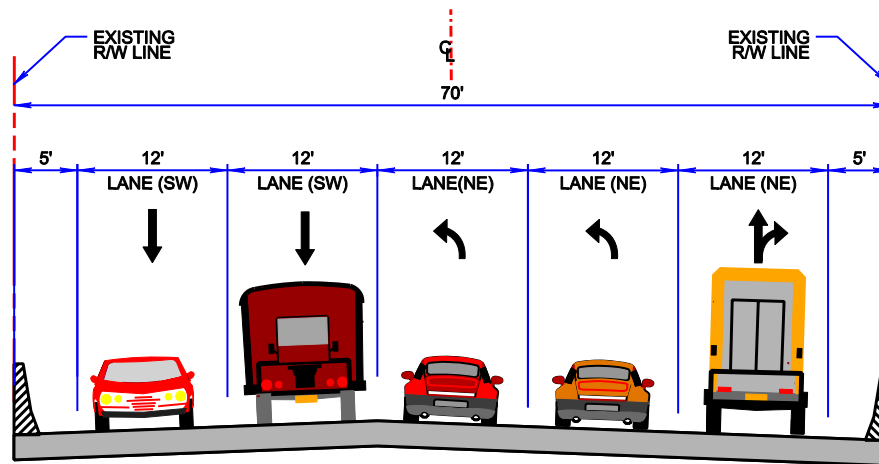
K 5-Lane Typical Bridge Section at NW 138th Street (2008)
